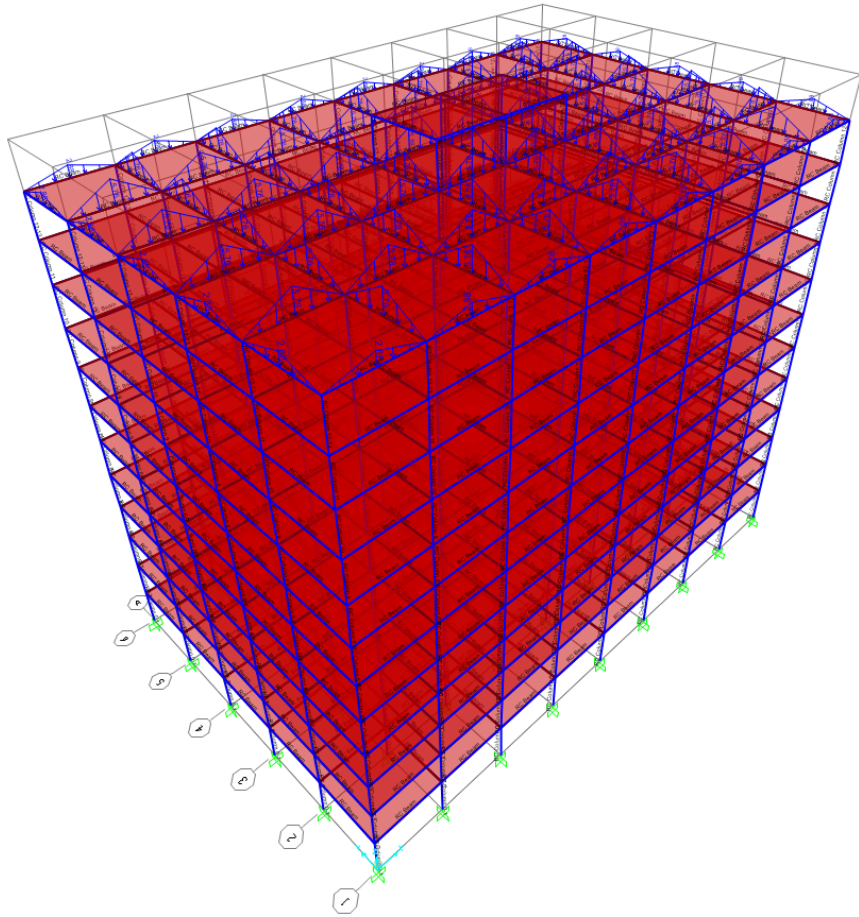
3D Uniform Roof Live load distributed to Frames
